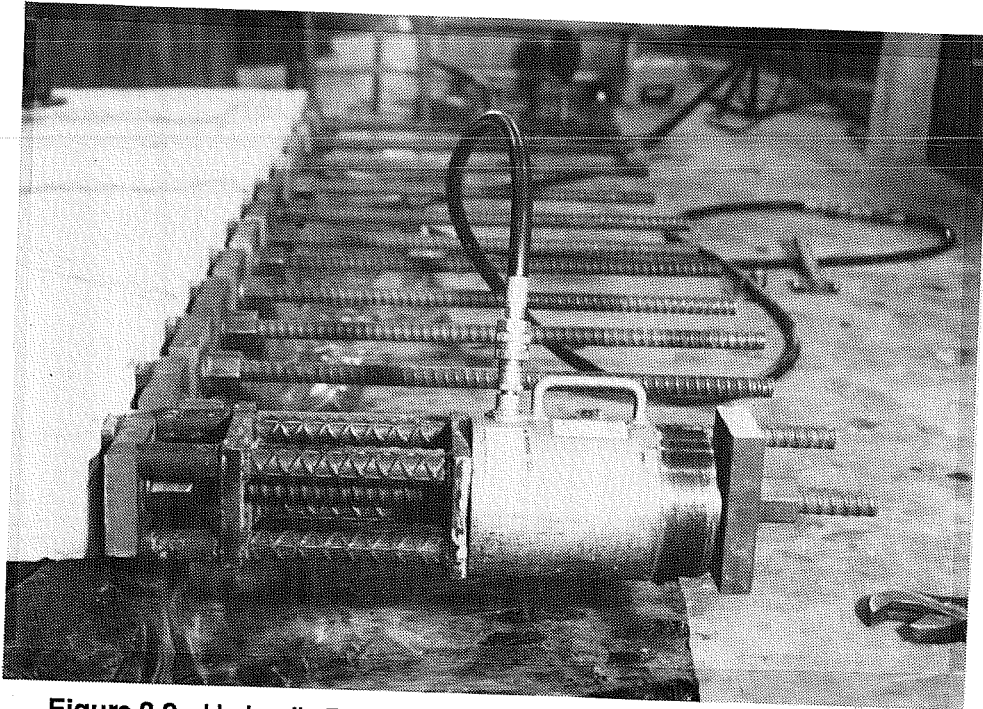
Hydraulic Ram Loading Anchor With Dywidag Threaded Bar
